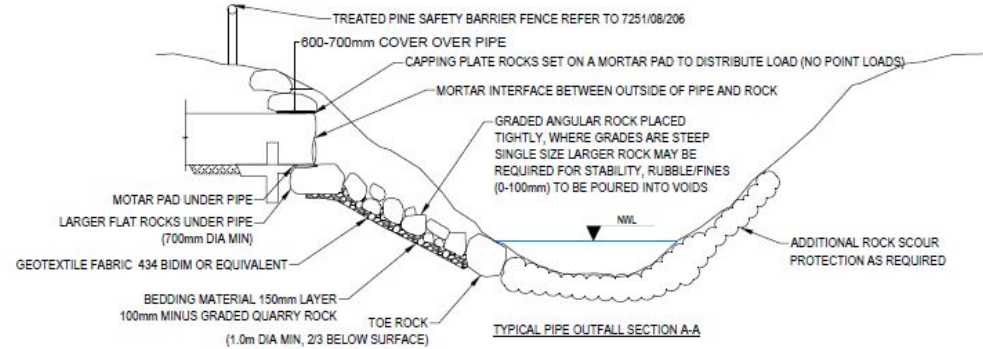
Proposed Rivulet Stormwater Connection (Typical)
